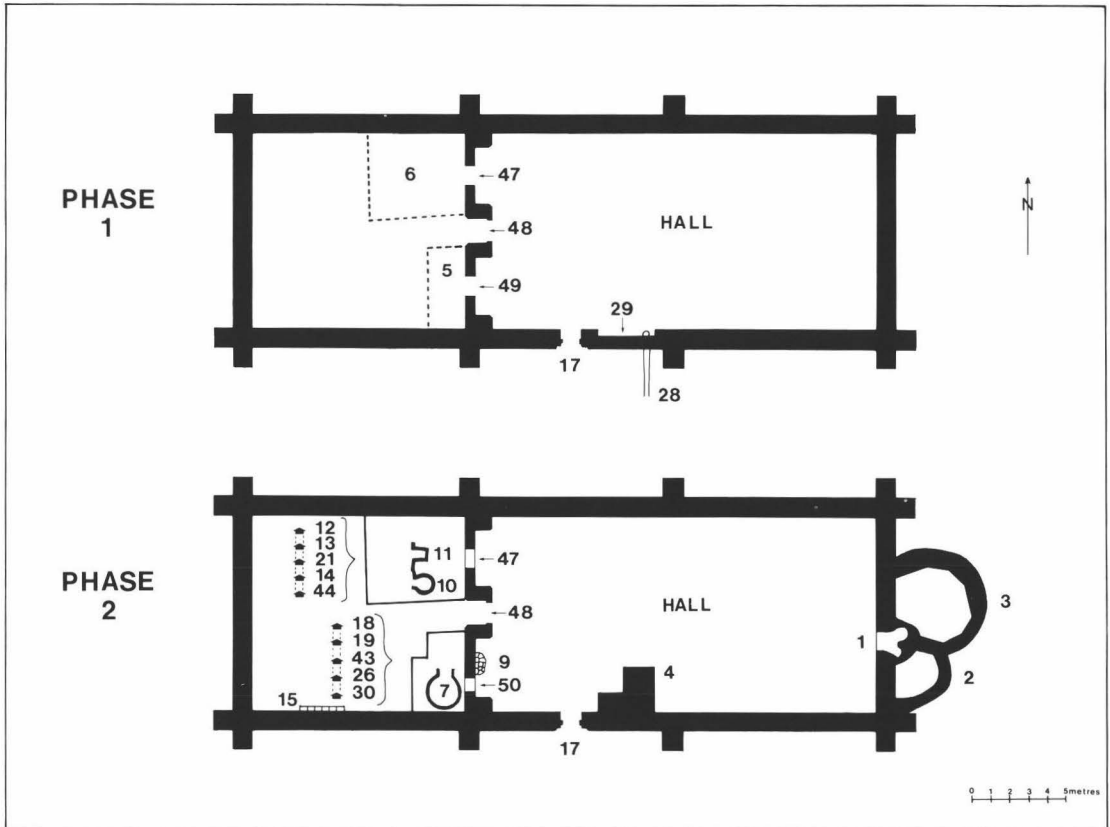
Reconstructed ground plan of building 1, showing the original layout of the hall building of Phase 1 and the later modification and additions made during Phase 2. Each series of hearths is indicated adjacent to the service area in which they were constructed.
